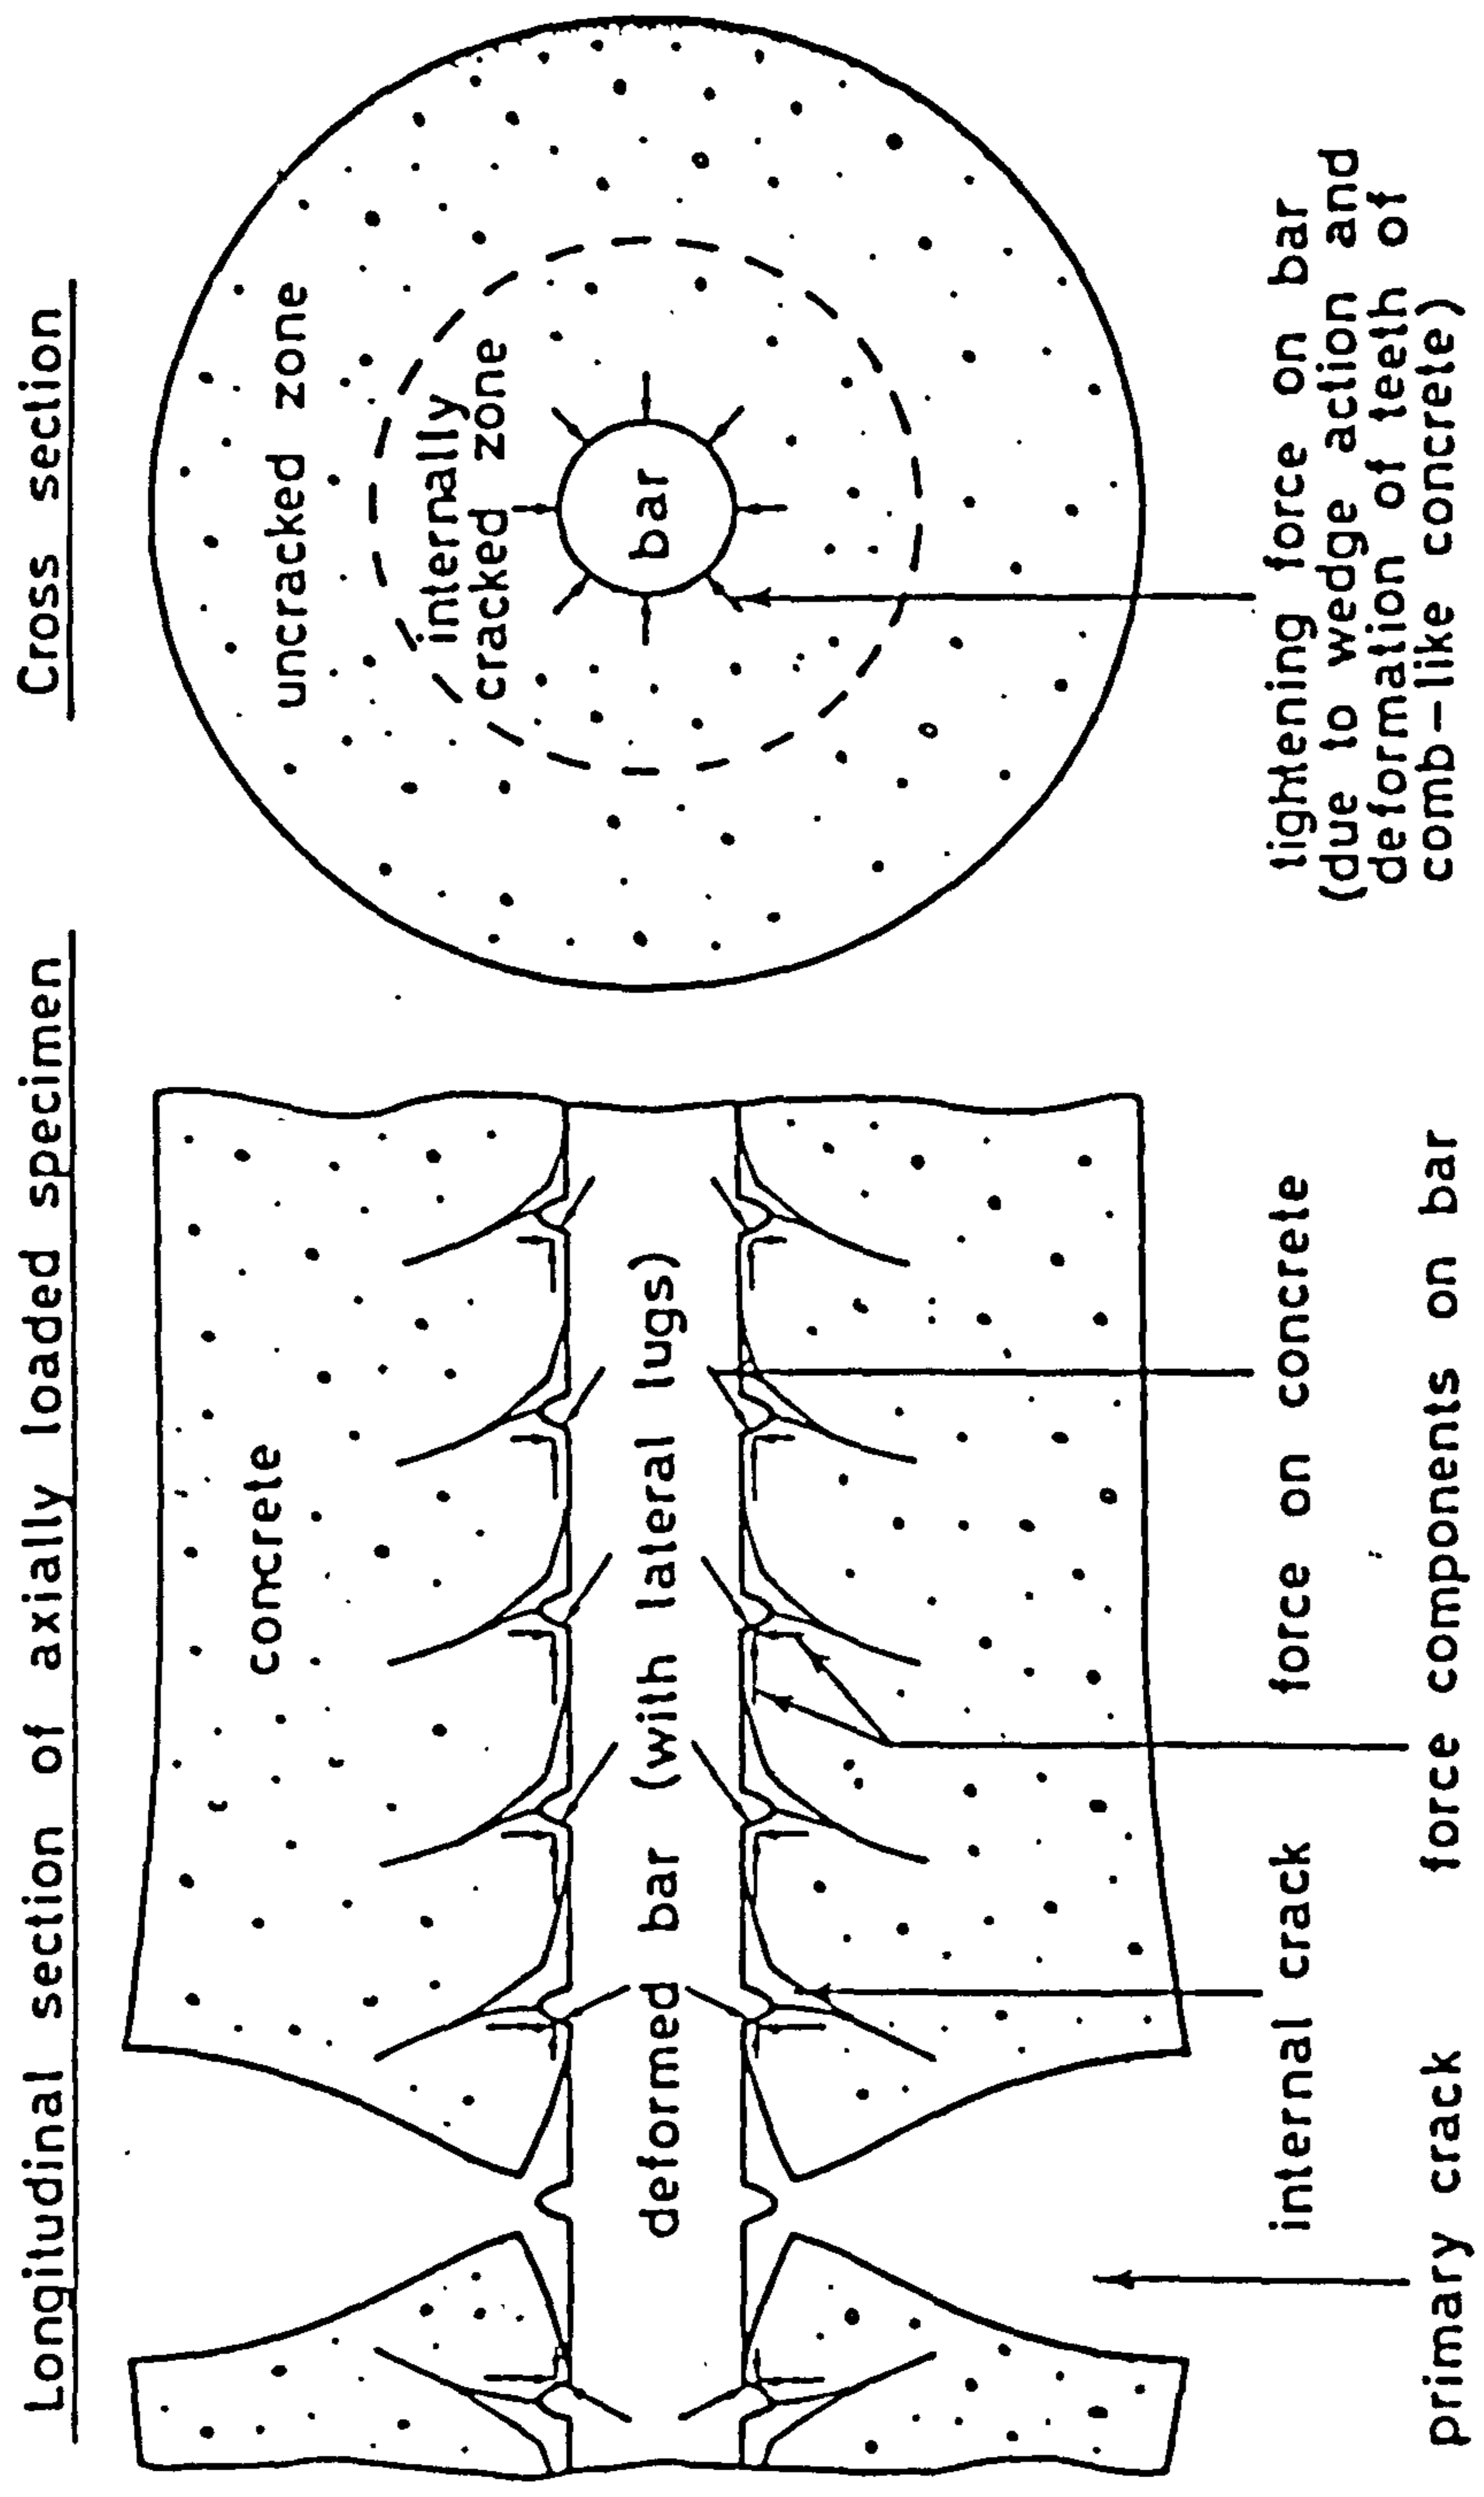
Cracking of concrete around reinforcing steel according to Goto
